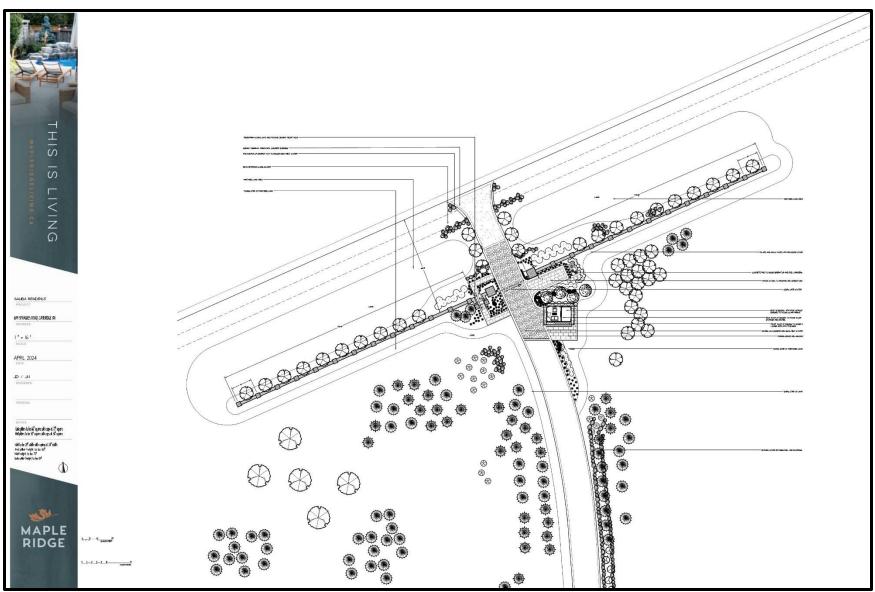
Site Plan for Proposed Entrance (Provided by Slotegraaf Construction 2024)
